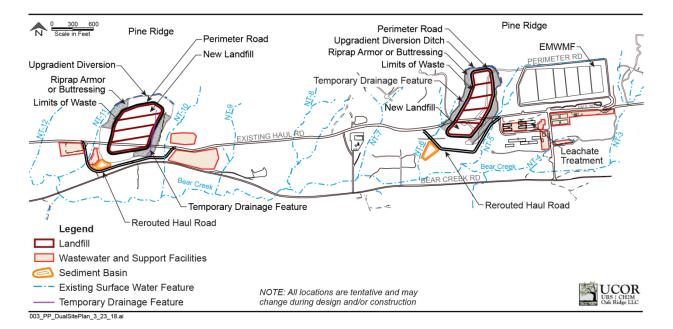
Dual Site Bear Creek Valley EMDF site plan.
